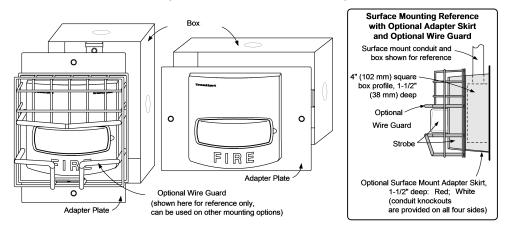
Wall Mount Installation Reference; Adapter Plate, Guard, and Adapter Skirt
